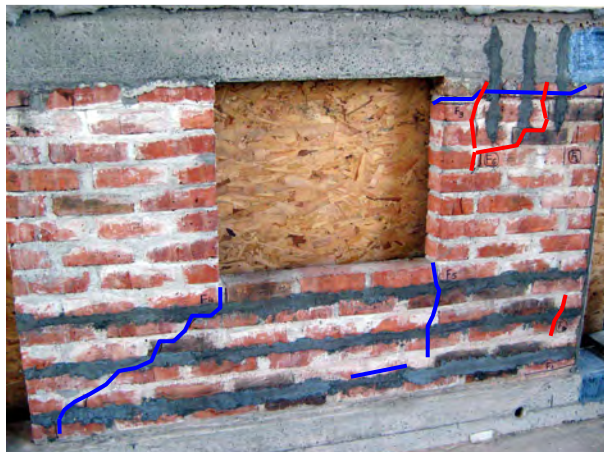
Strengthened masonry wall failure crack pattern
